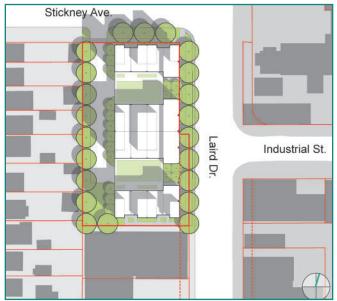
Stacked back-to-back townhouses with at-grade parking
